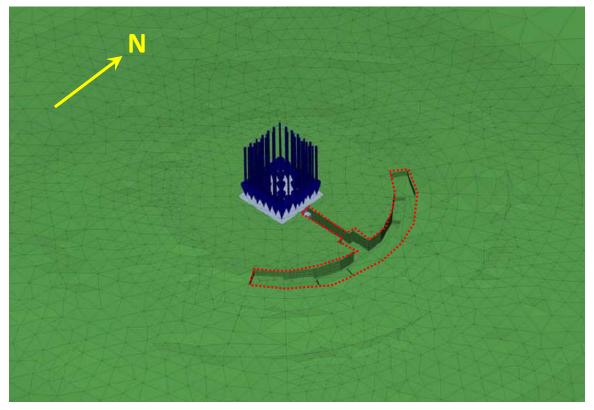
Excavation for Alternative A1: tunnel and recessed entrance.
